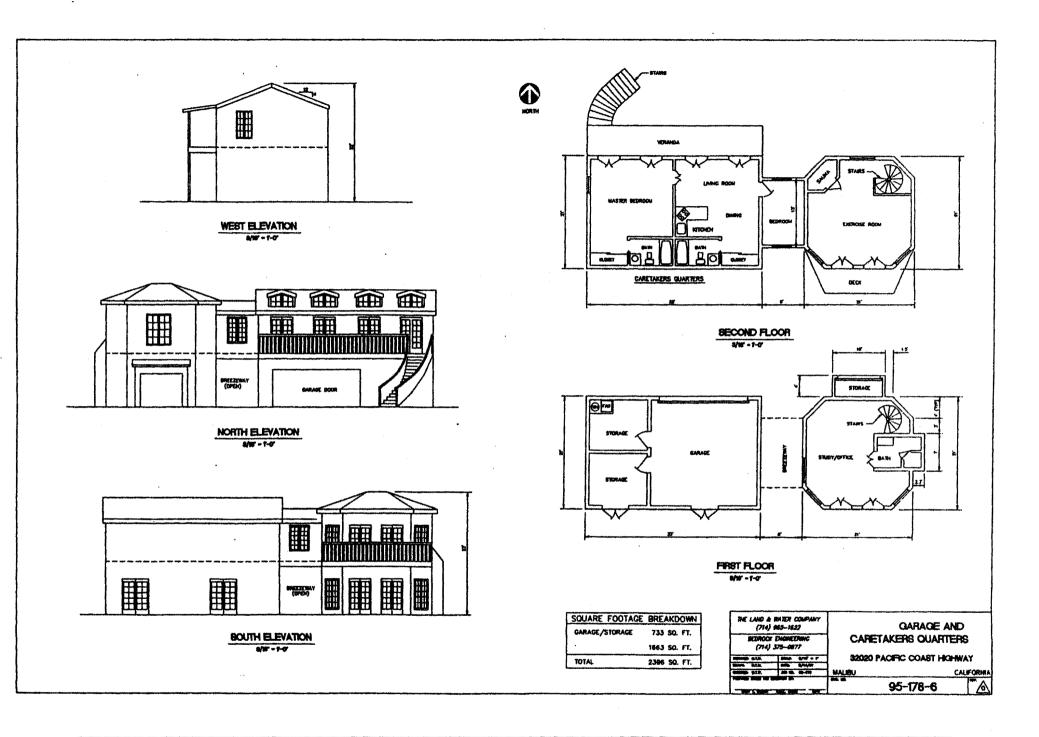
(4-97-111) Elevations/Floor Plans for Structures with Proposed Additions
